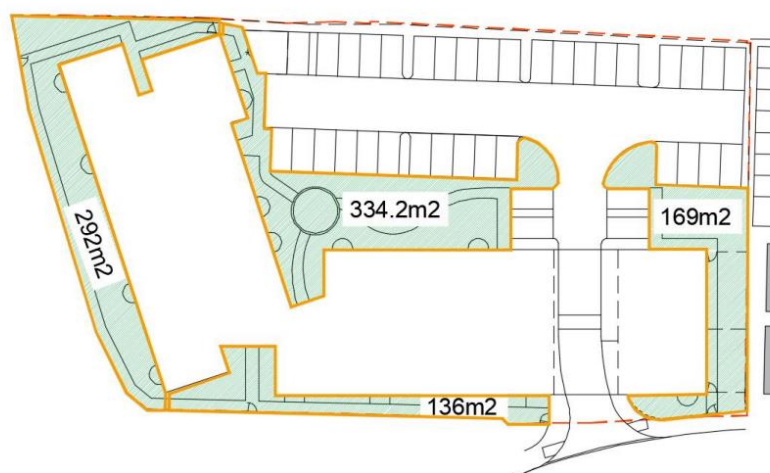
Breakdown of areas of communal open space around proposed apartment building with access by residents only.
